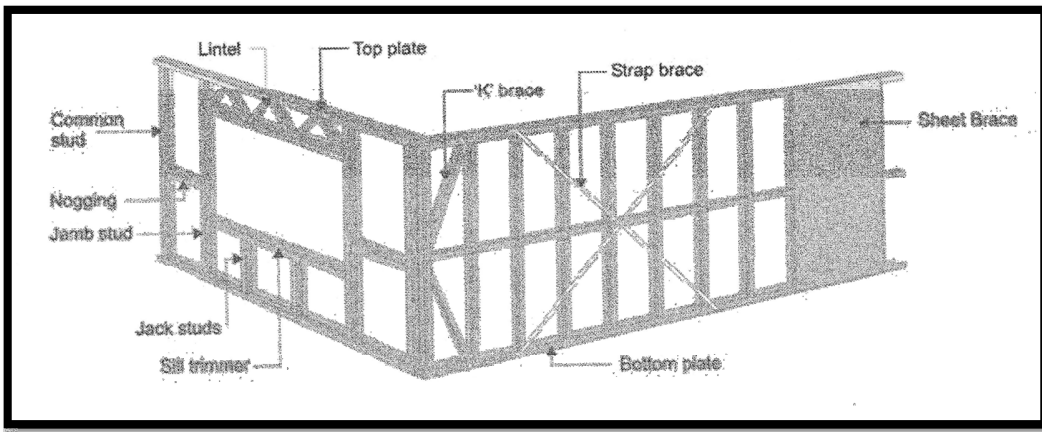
Wall elements used in LSFb. (SASFA, 2010)
